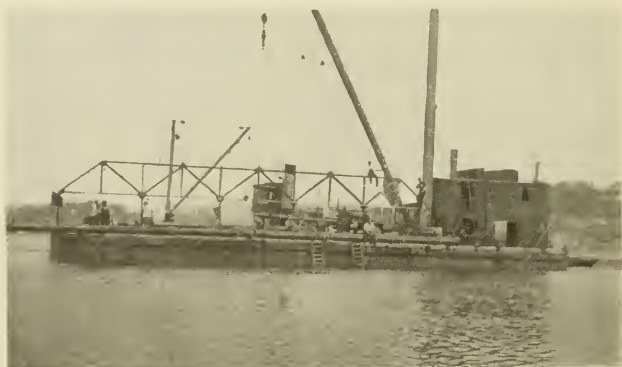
CAST-IRON PIPE BEING JOINTED ON LIGHTER.
